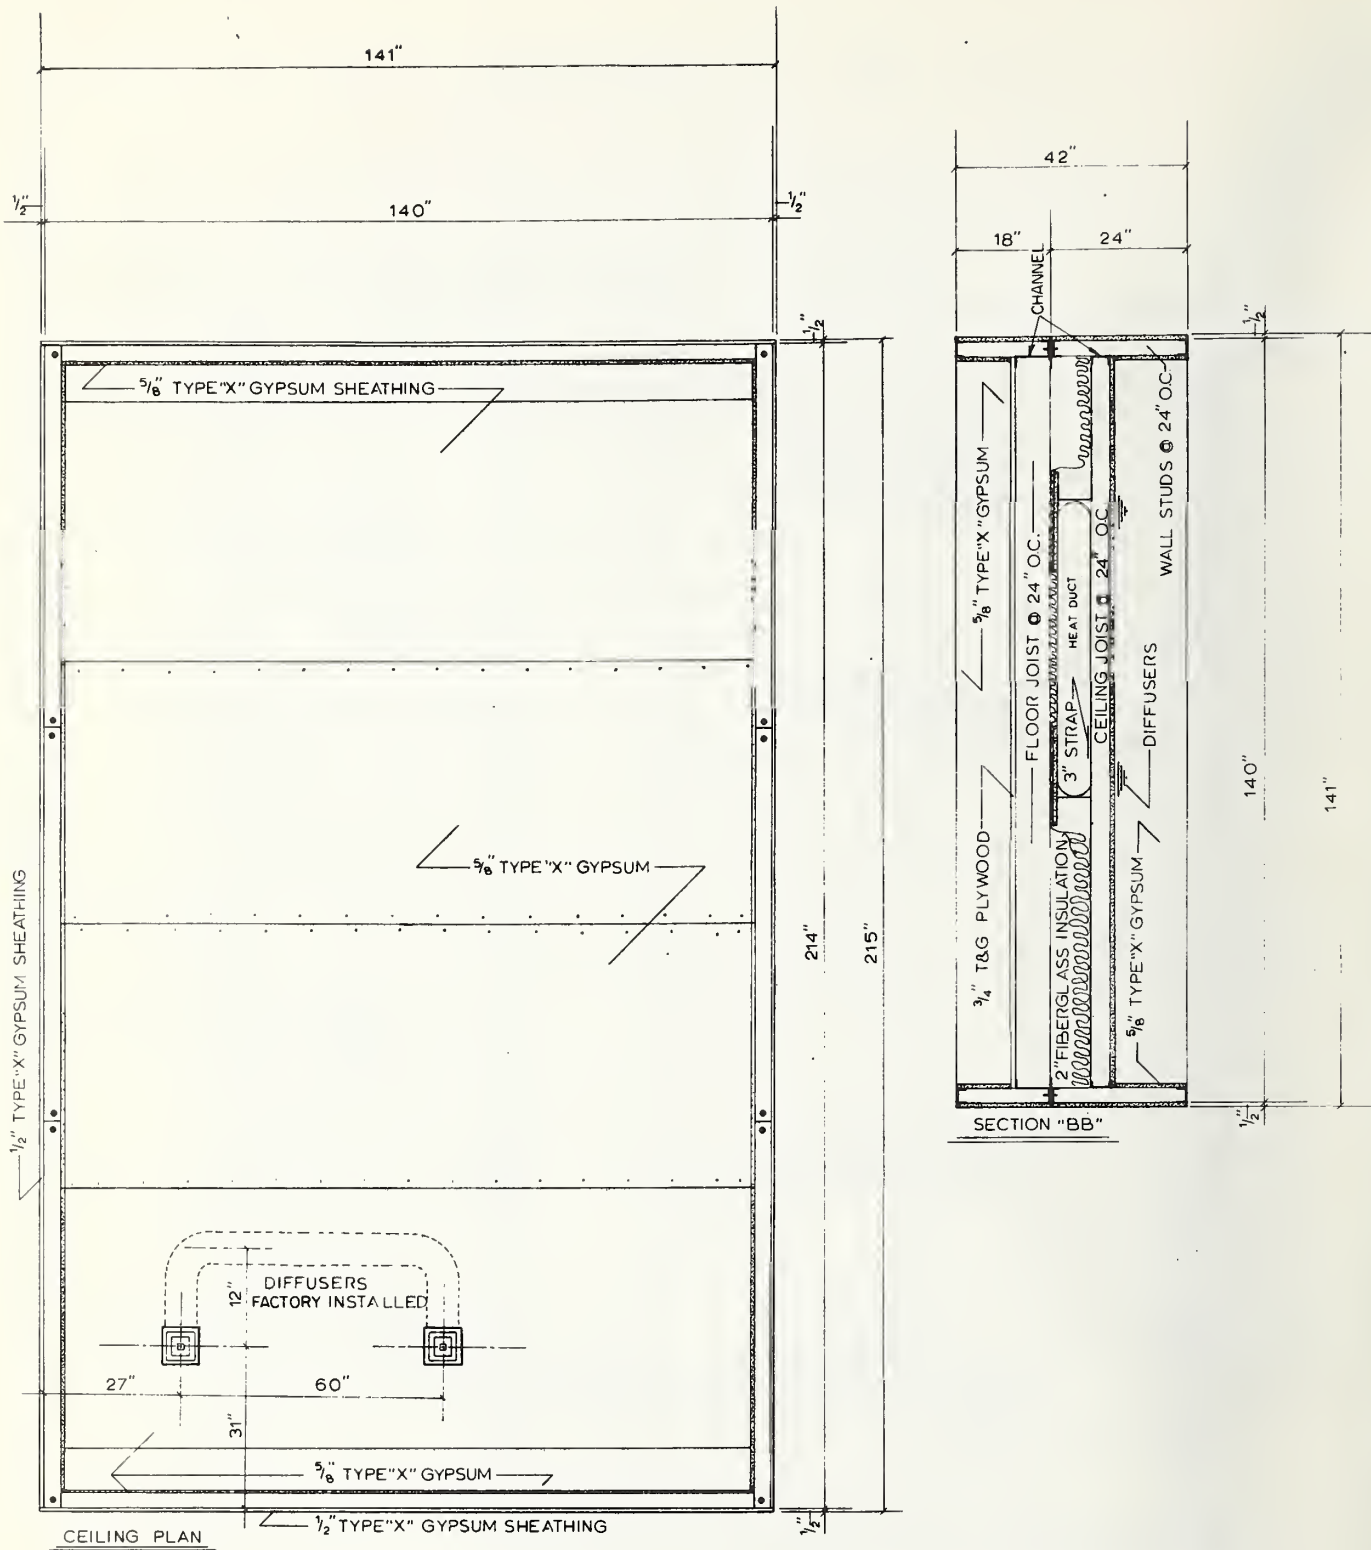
FLOOR-CEILING ASSEMBLY CONSTRUCTION
